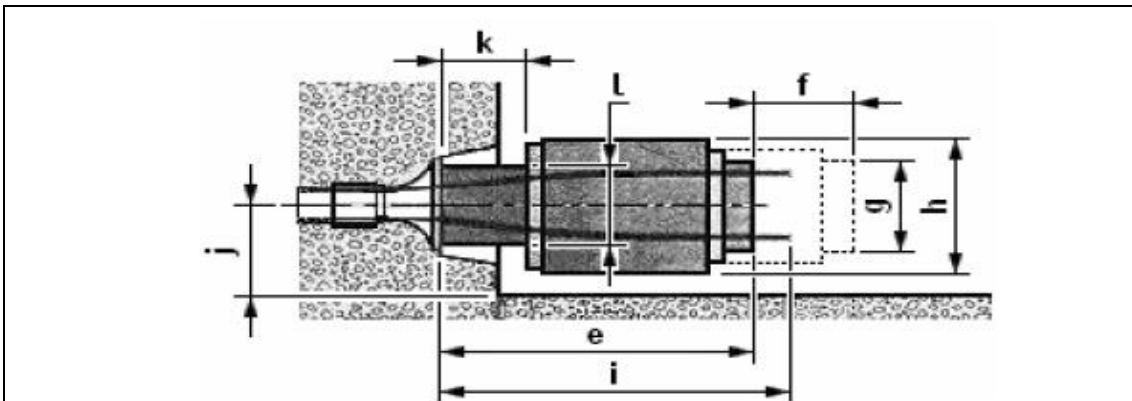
Typical Multi-Strand, Center Hole, Stressing Jack
